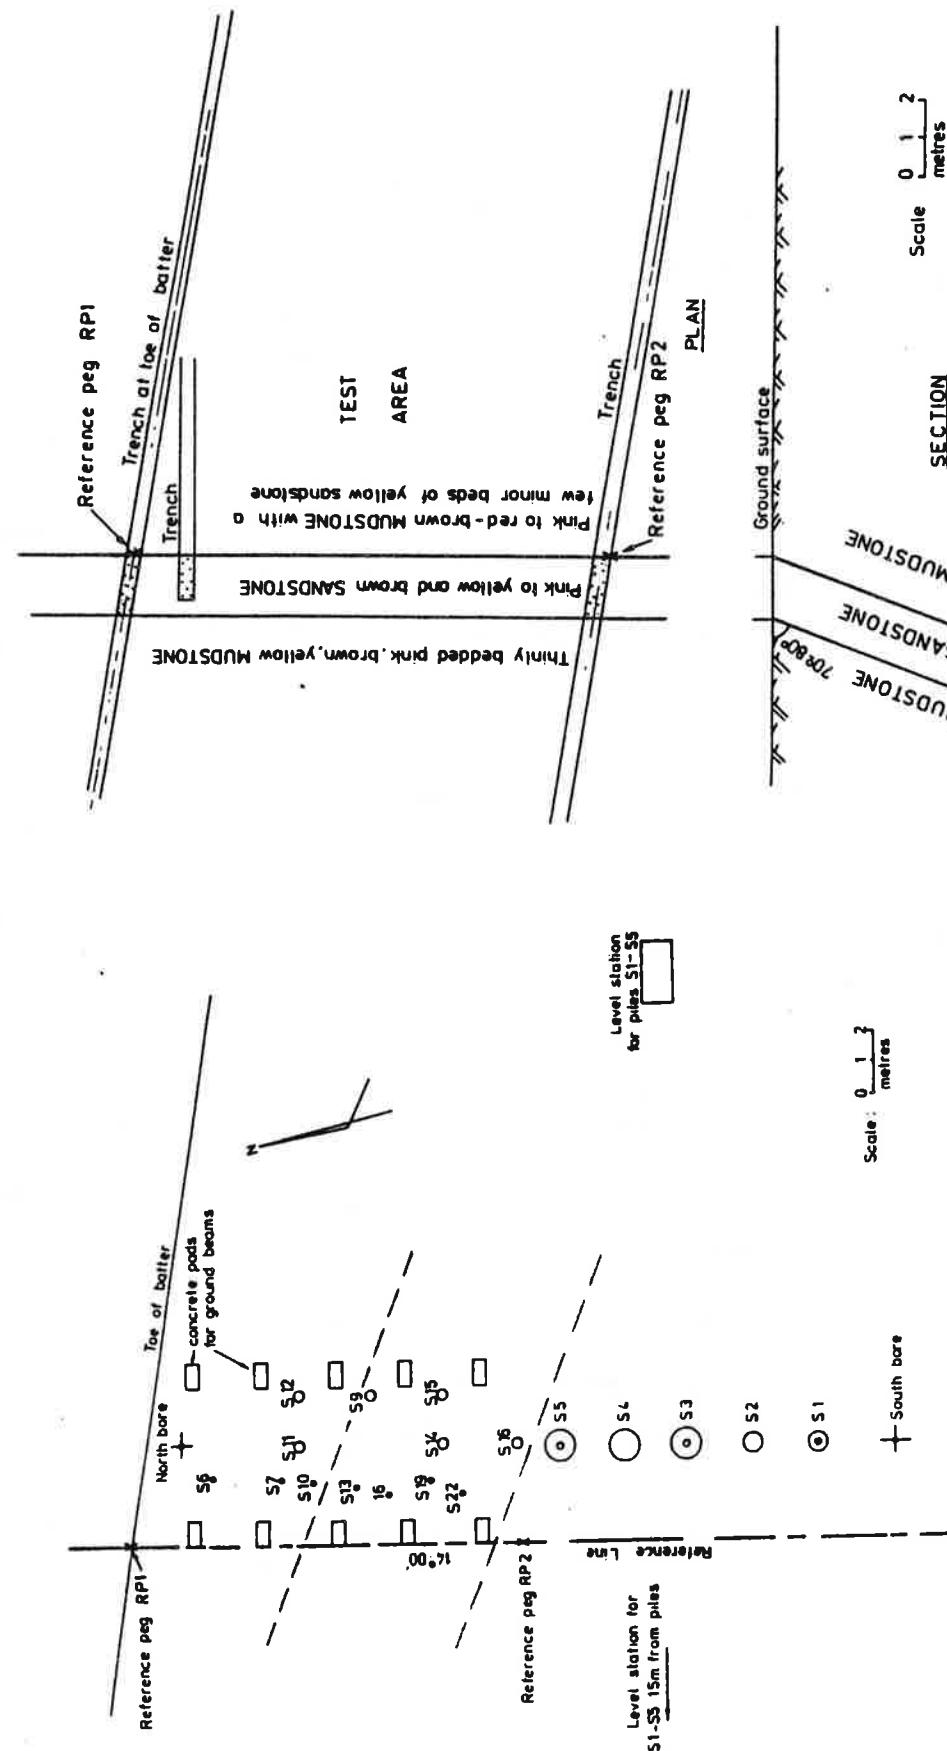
PILE LOCATION PLAN FOR STANLEY AVENUE
